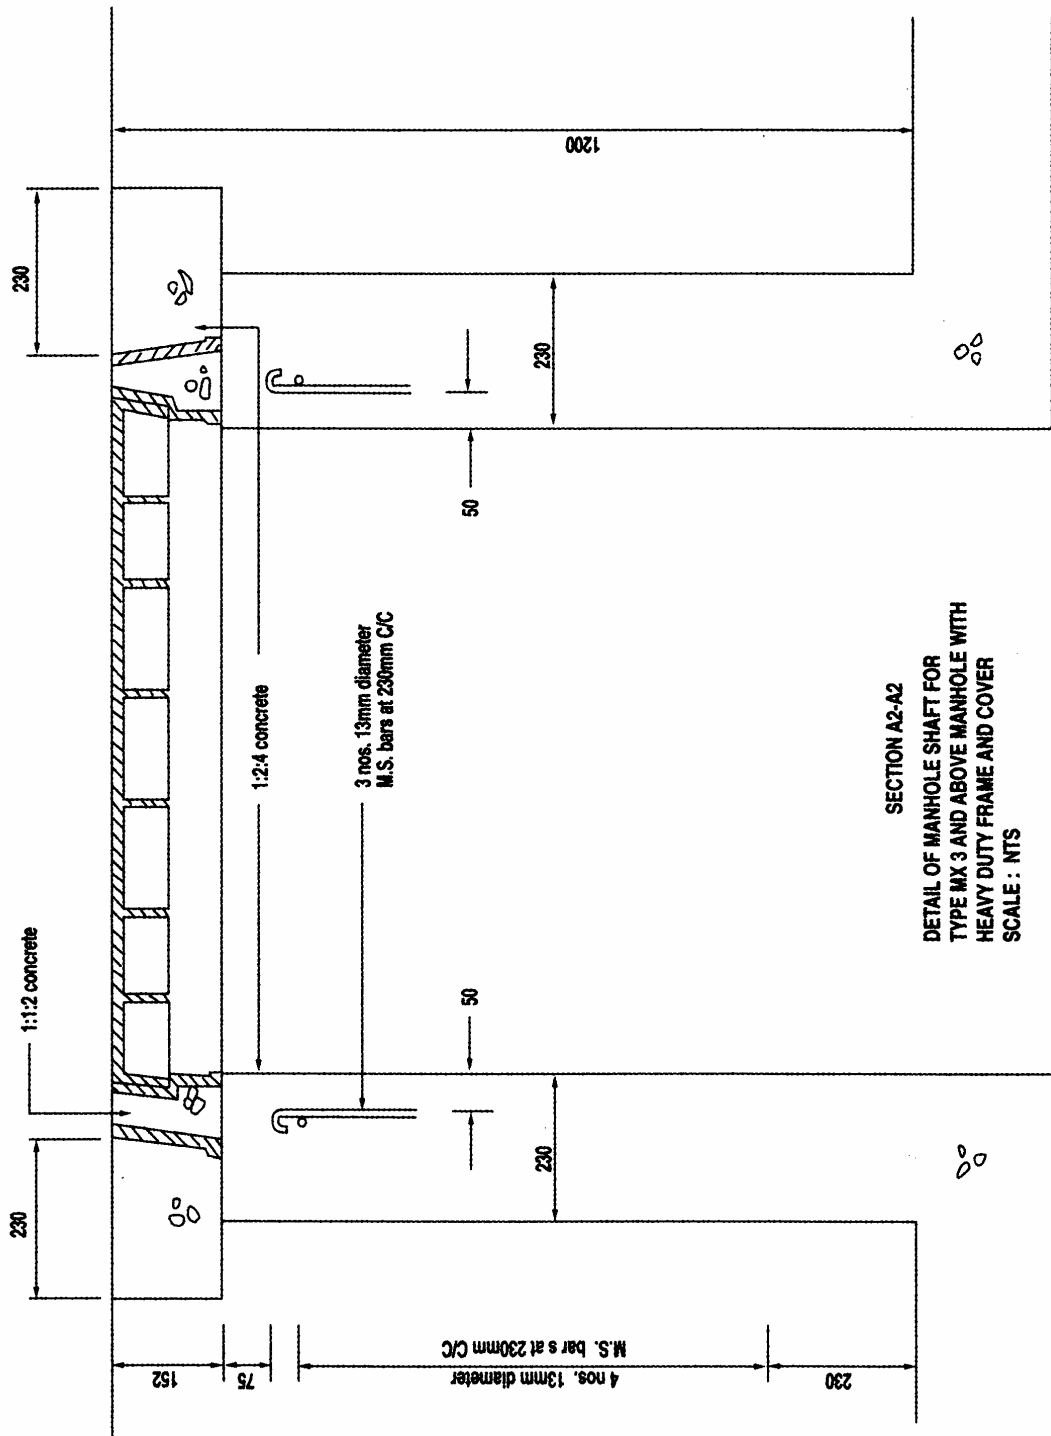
MANHOLE DRAWINGS - TYPE MX3 & ABOVE
